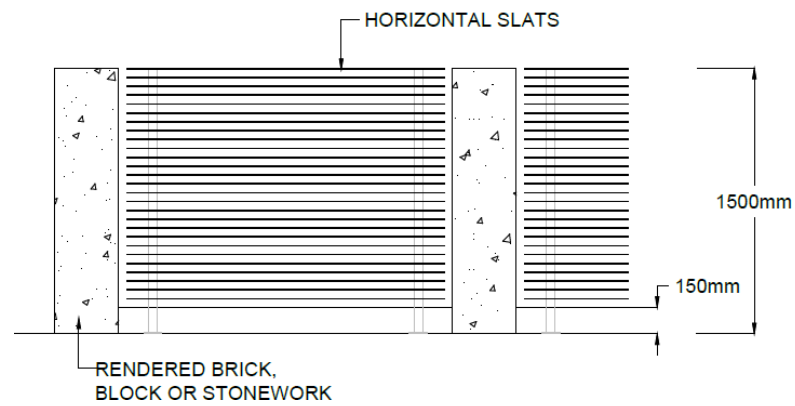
Whitlam – Ongoing Provisions (Elevation of Courtyard Wall)
